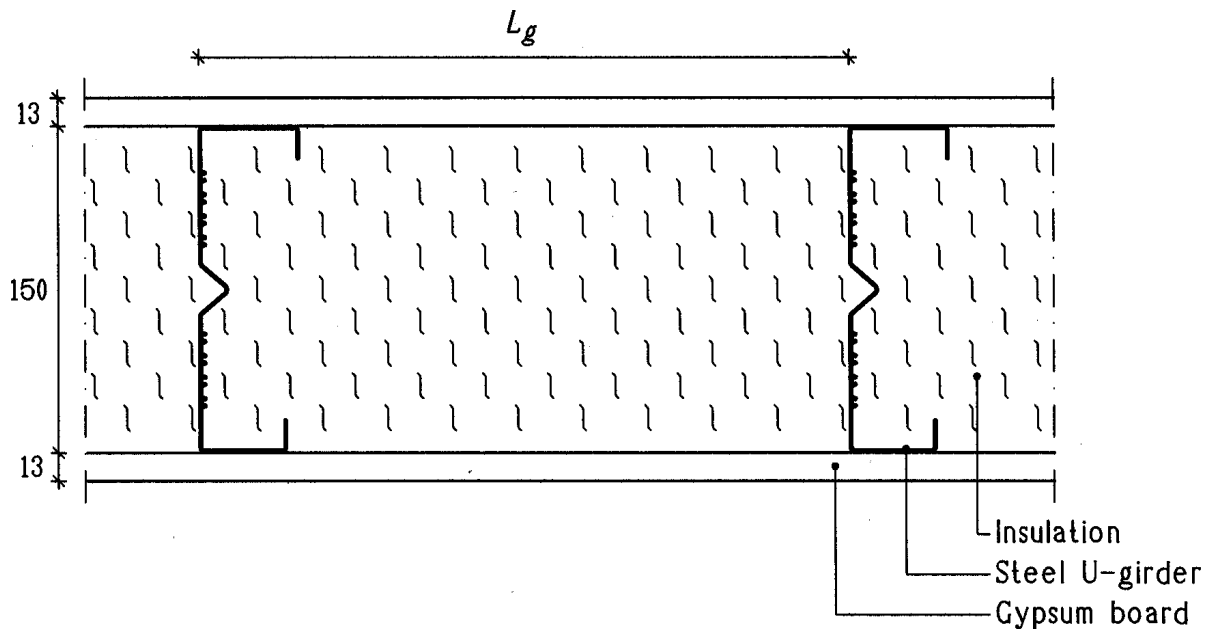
Principle sketch of a wall with metal U-girders between two gypsum boards.
